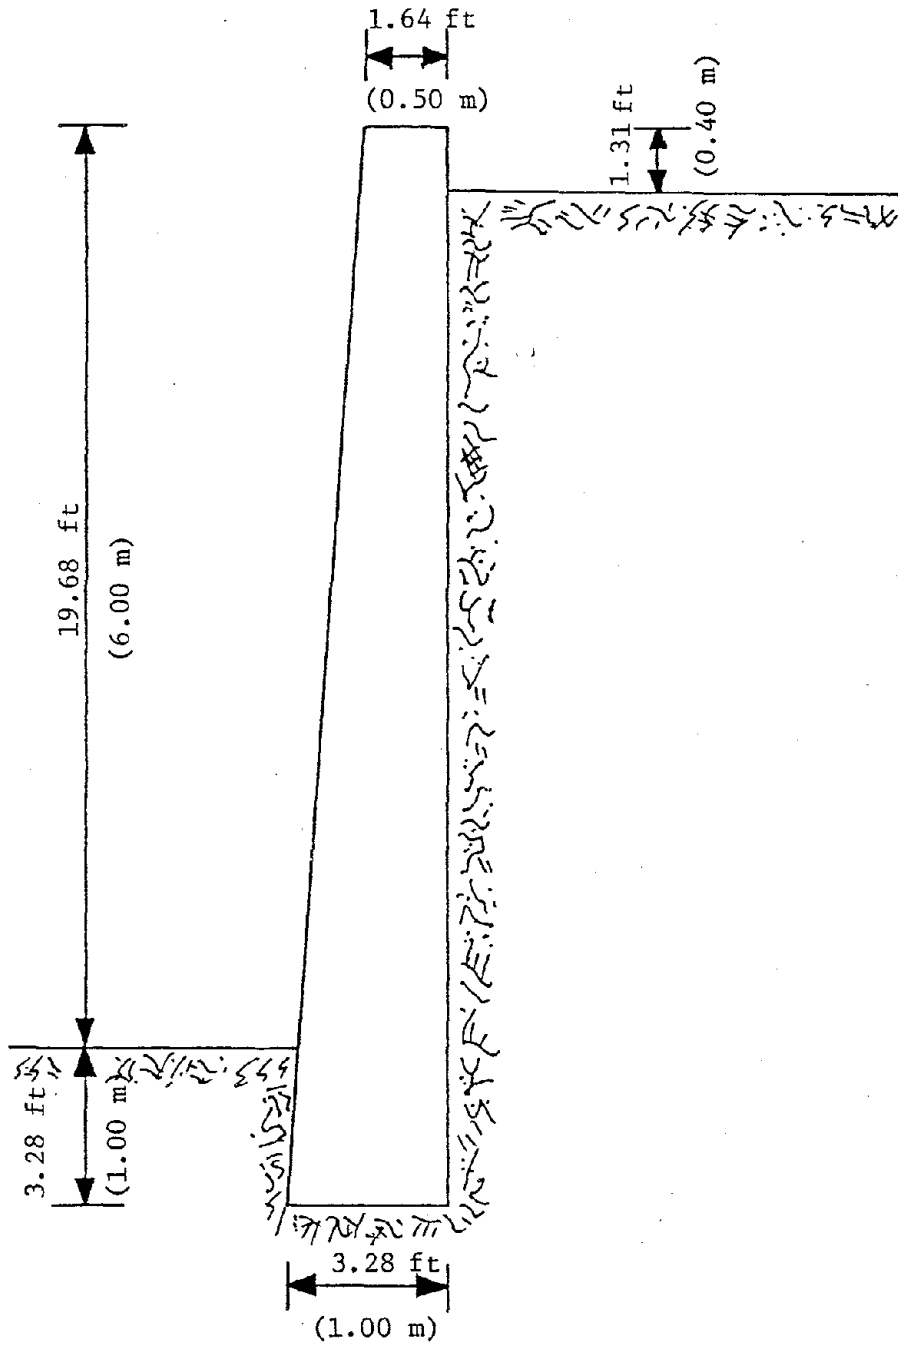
CROSS-SECTION OF WINGWALL AT LOCATION B-B
